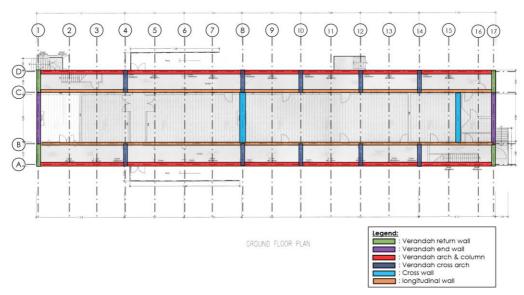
2013 G/F record framing plan, with different type of brick walls highlighted in colour dotted lines (Source: Architectural Services Department, Structural Appraisal Report 2013, with Author's edition)
